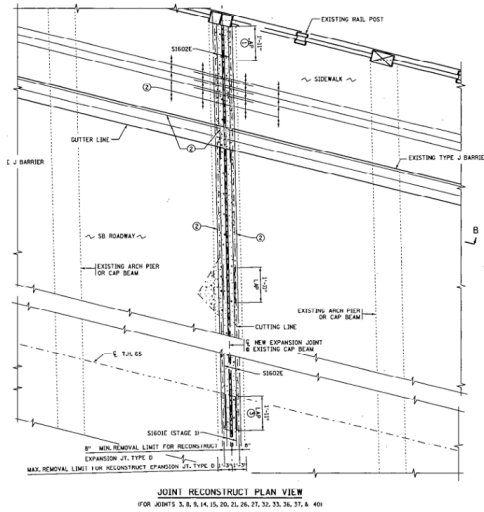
Half-deck plan showing strip seal joint in roadway and sidewalk for joints located adjacent to arch piers.
